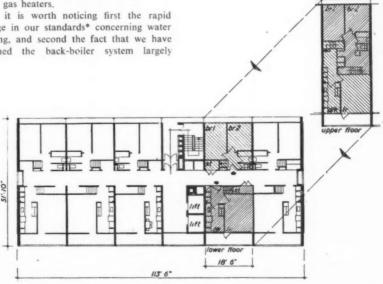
(above). Floor plan of LCC 12-storeyed point-blocks at Roehampton designed for economic central heating. Fig. 6 (right). Floor plan of LCC 19-storeyed maisonette project for Tidey Street, Stepney-another centrally-heated, deep tower-block with mechanically ventilated bathrooms and w.c.'s.
